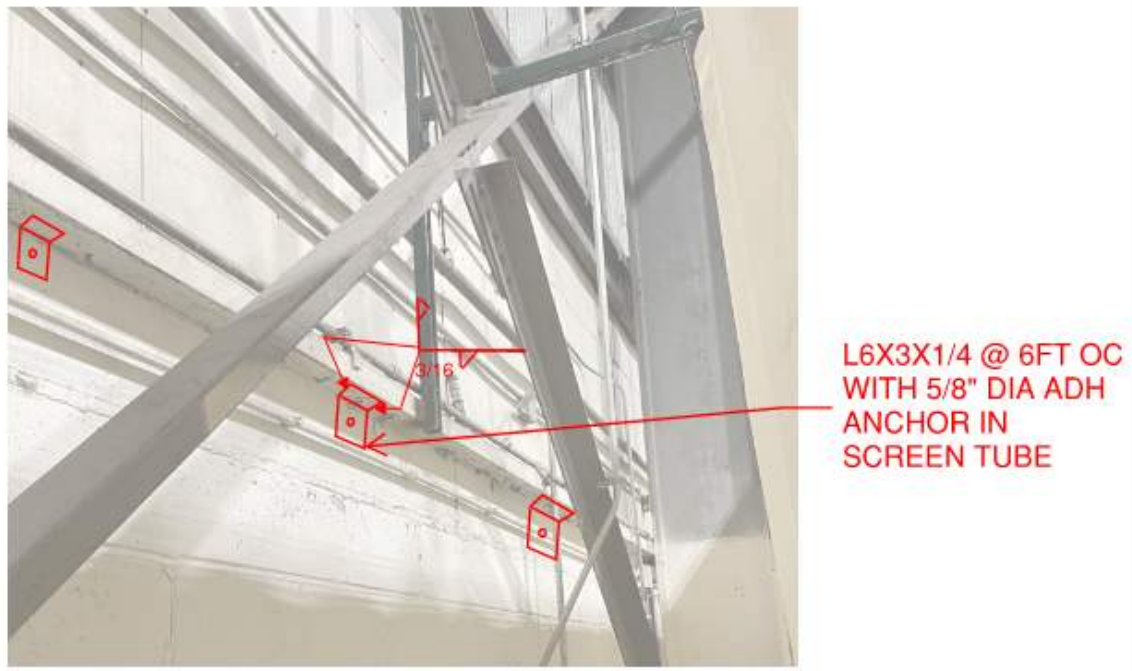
North Building Wall Top of CMU Restraint– IEBC 2021 (sections 906.7) Compliance Detail.
